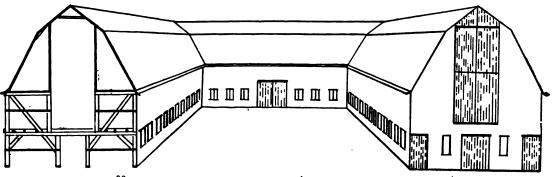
MODERN TYPE OF CATTLE BARN (ELEVATION AND CROSS-SECTION).
